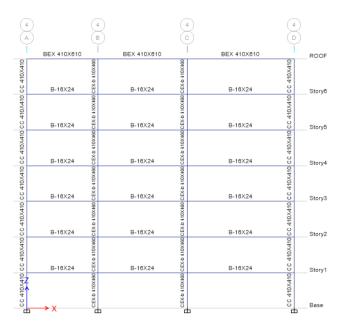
Grid 4A,4B,4C and 4D Column Position Layout
